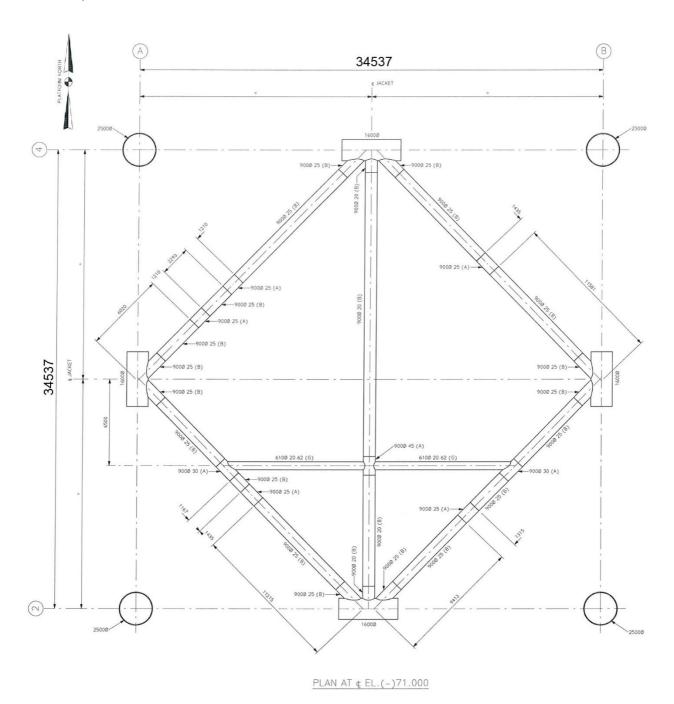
Solan jacket bracing plan at EL. -71.000
